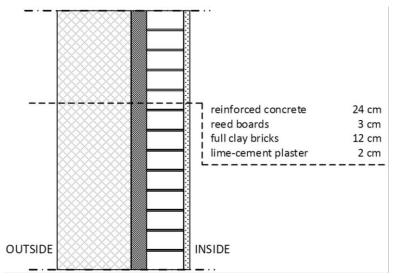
East- and west-facing external walls from the ground floor to 13th floor (EW2).
